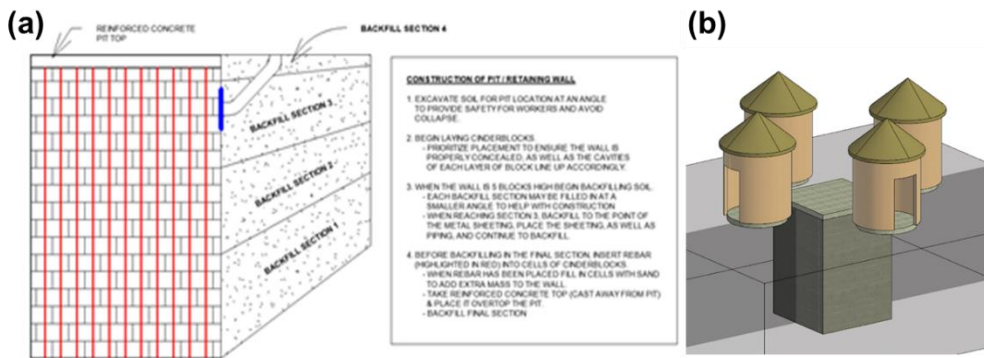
(a) Construction plan for the sanitation pit in Kenya, (b) 3D view of the sanitation facility with the pit.
